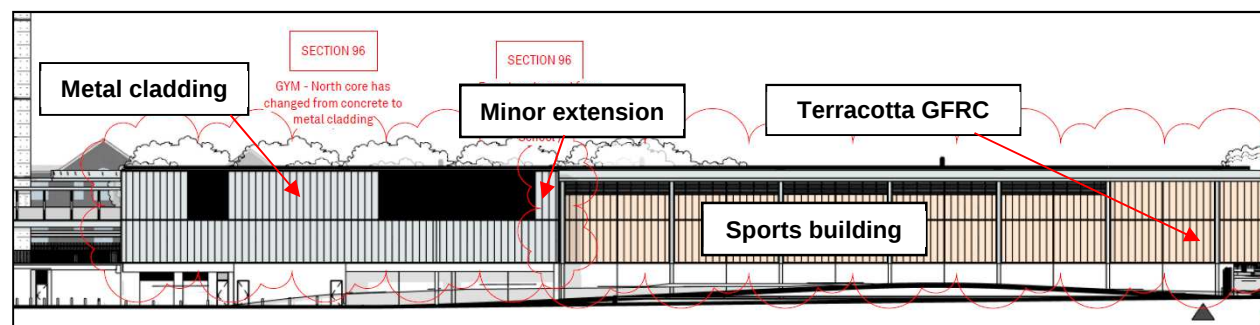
Proposed sports/movement complex north elevation (Source: Applicant's Modification EIS)
